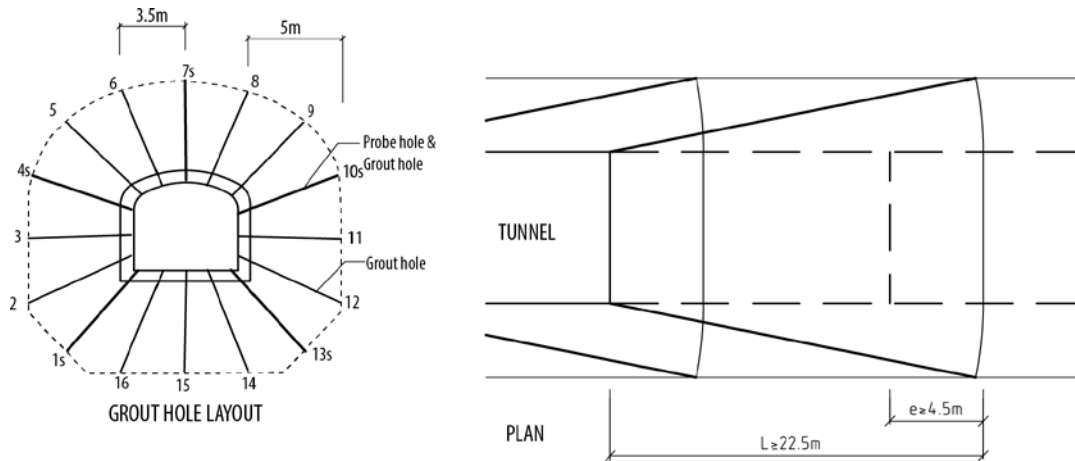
Layout of the probe hole and grout hole used for the grouting operation, section and plan view.
